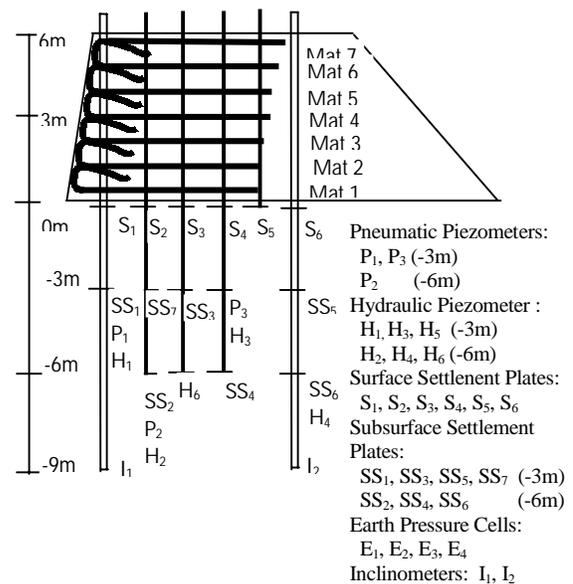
Schematic Diagram of The Instrumented Geogrid Test Wall Embankment.
